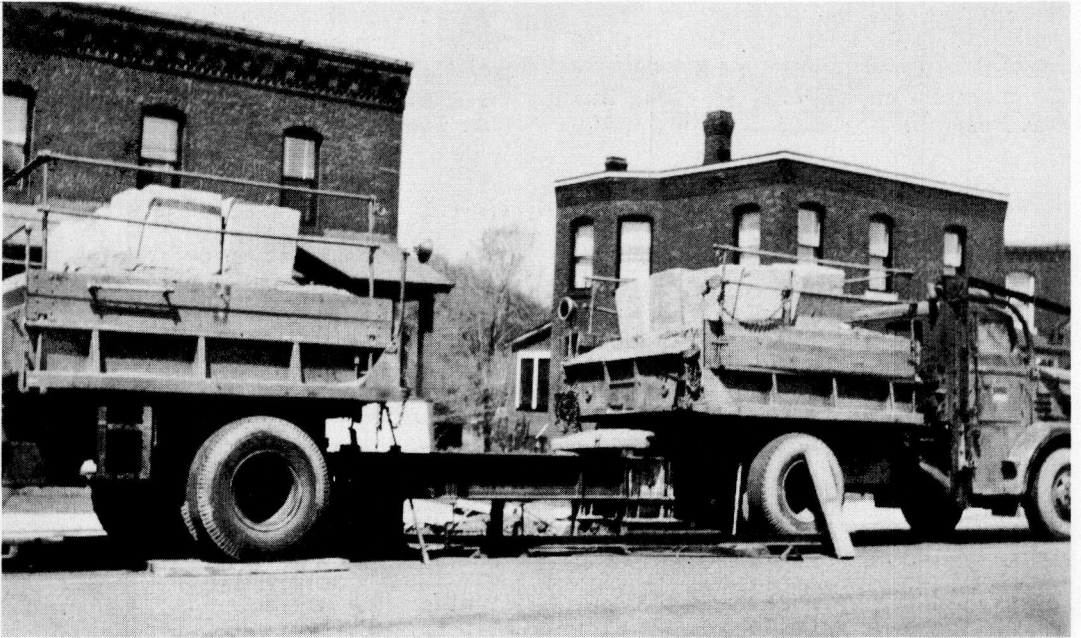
Figure B. Laboratory bearing-power equipment, showing position of loaded trucks.
